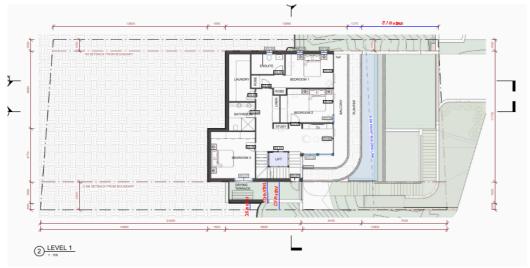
Level 1 with only a 0.6m setback to the lightwell/retaining wall/drying terrace
